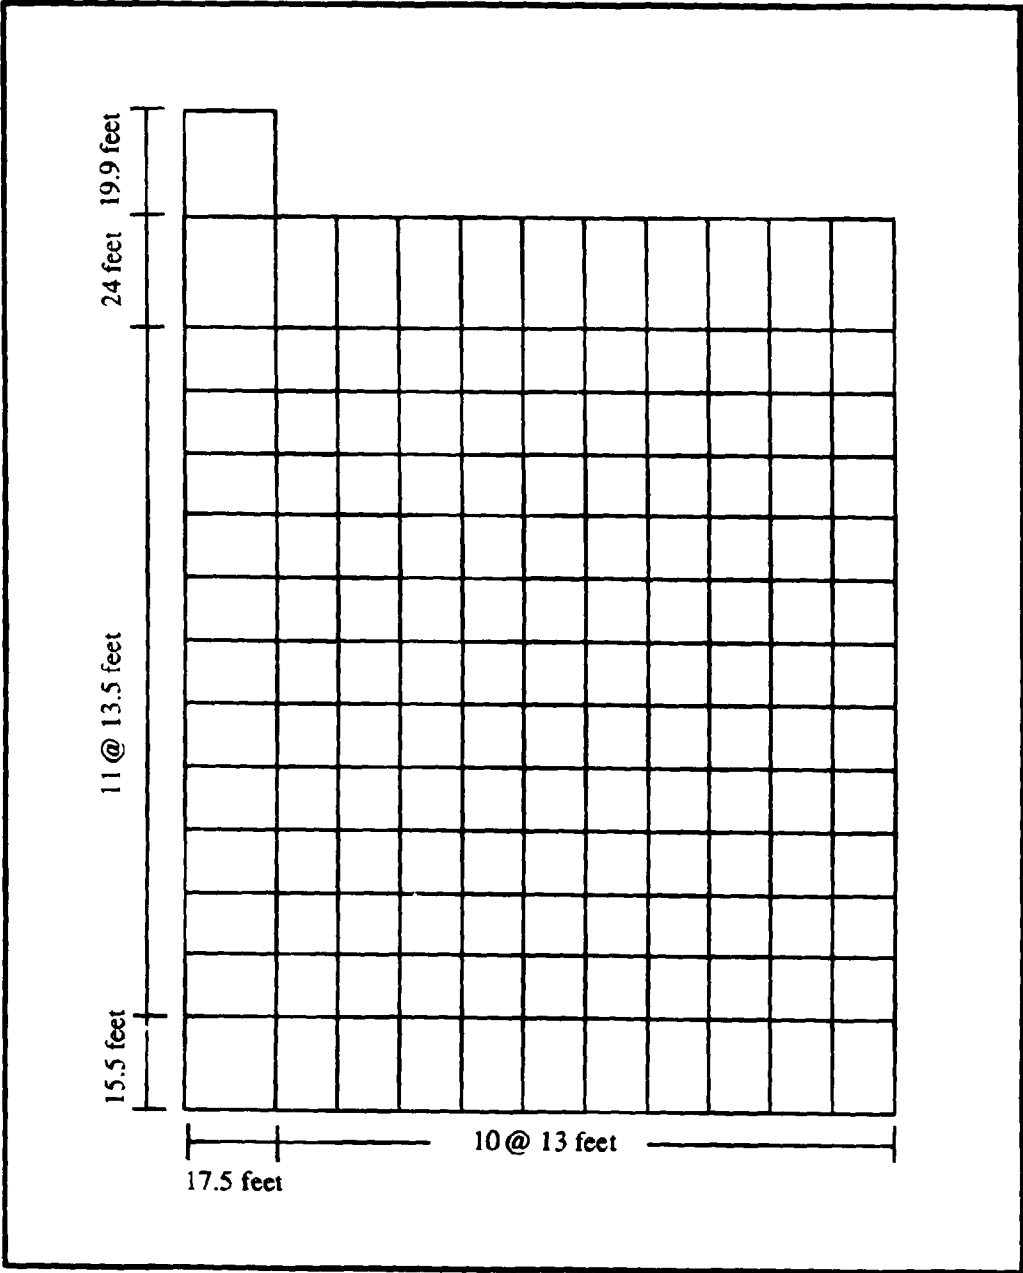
Elevation view of the Santa Clara Co. office building.
